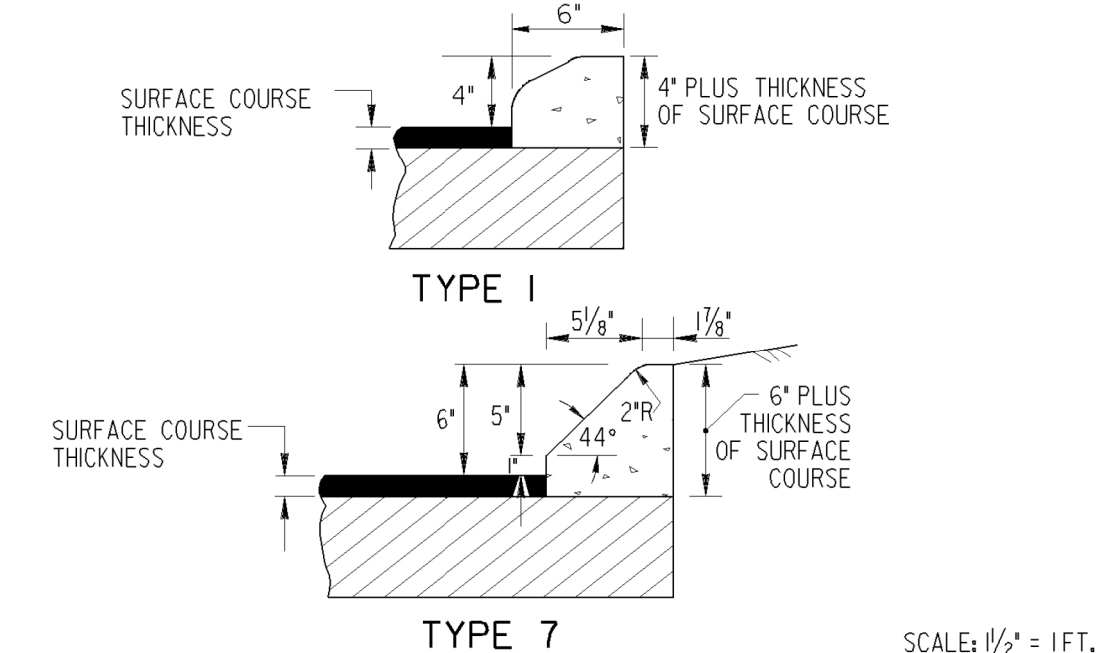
DETAILS OF RECESSED CURB FOR DRIVEWAYS
